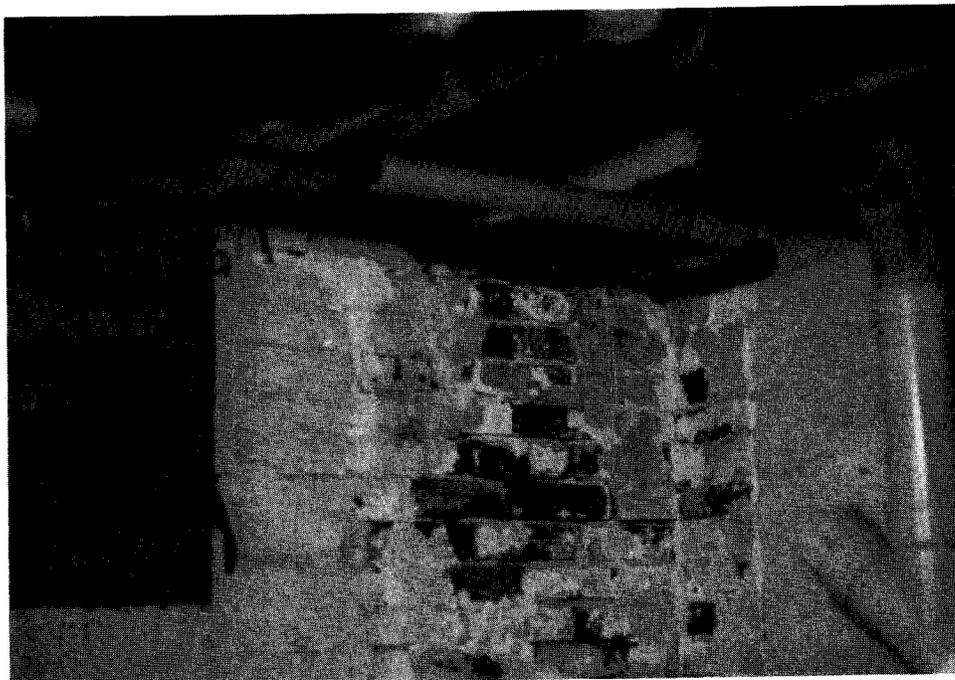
Keeper's Dwelling, masonry cracks at northwest corner of basement.
